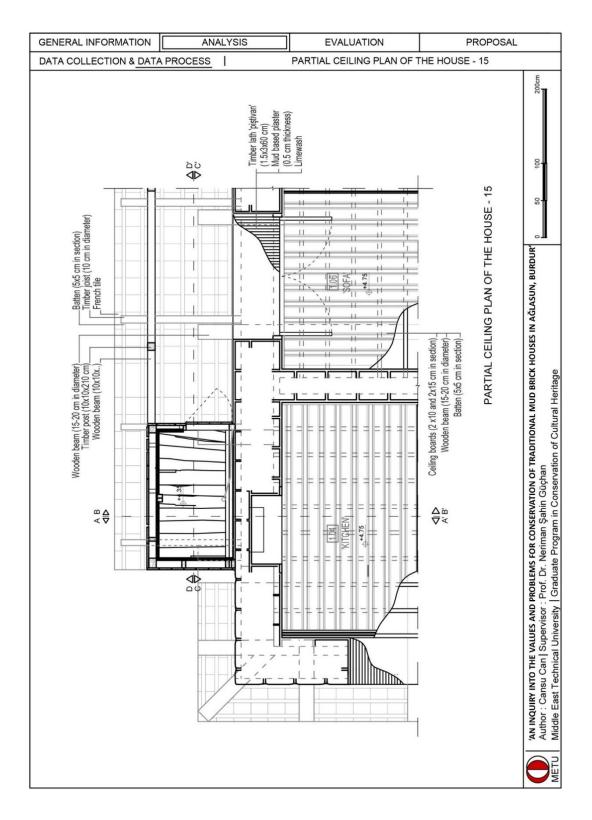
Ceiling Plan of the toilet and Its Relation with the Kitchen
